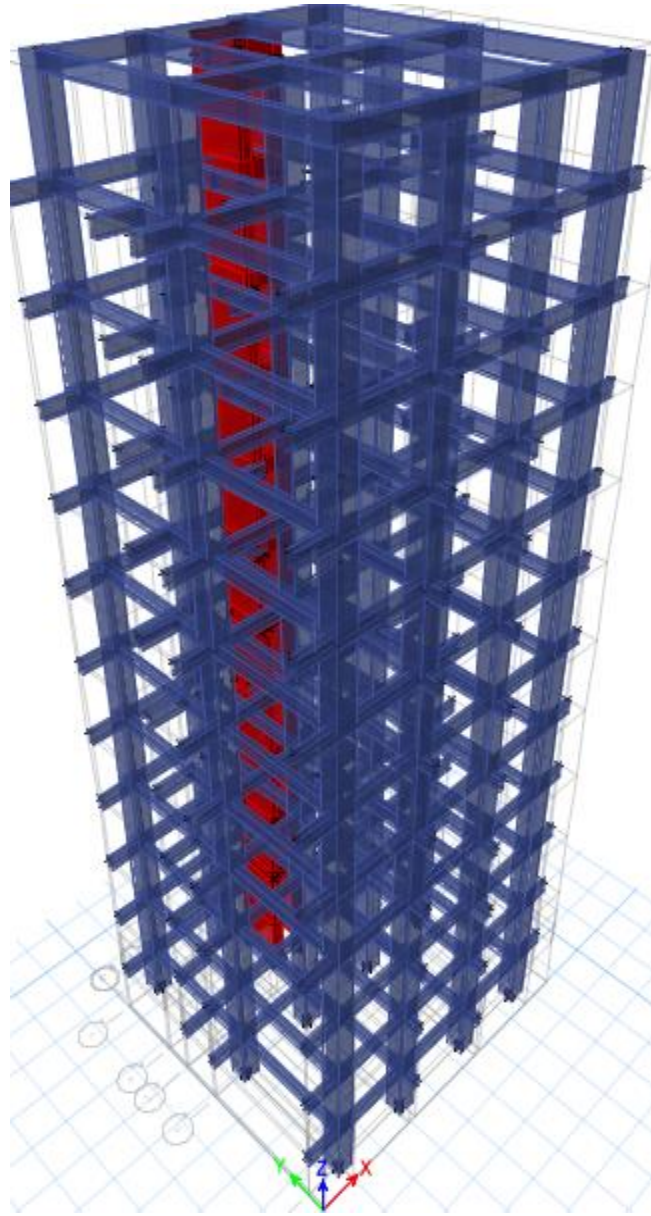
3D model of the building from ETABS 2016v16.1.0
